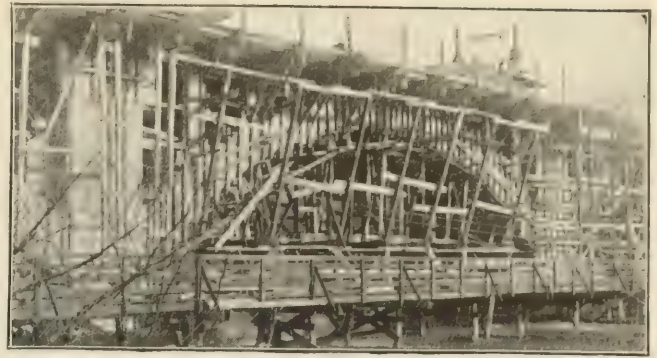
FORMS AND FALSEWORK OF NEW BRIDGE, WITH TEMPORARY FOOT-BRIDGE BELOW
